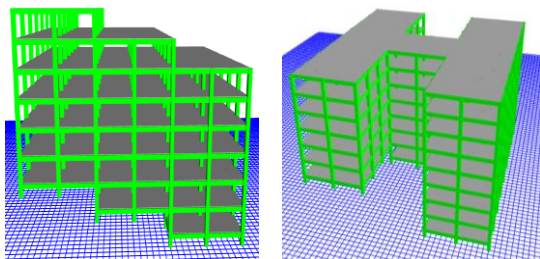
Elevation of H Shape Structure & Step Back Set Back Structure
